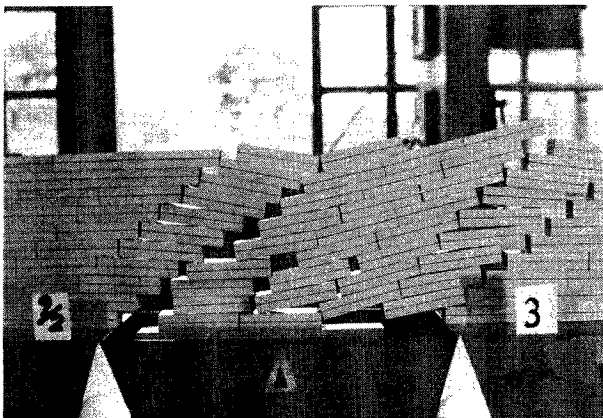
Failure pattern of blocks piled in horizontal strata with unsymmetrically staggered joint.
